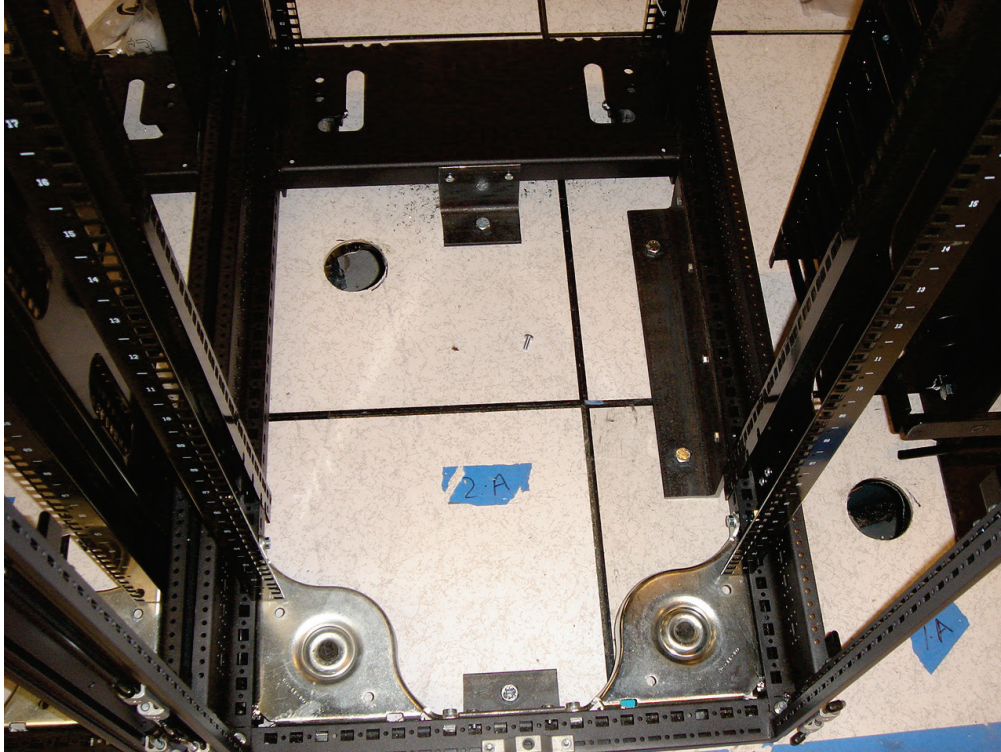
Base of data cabinet with supplemental angles bolted to strut bracing below floor (Photo courtesy of Maryann Phipps, Estructure).
